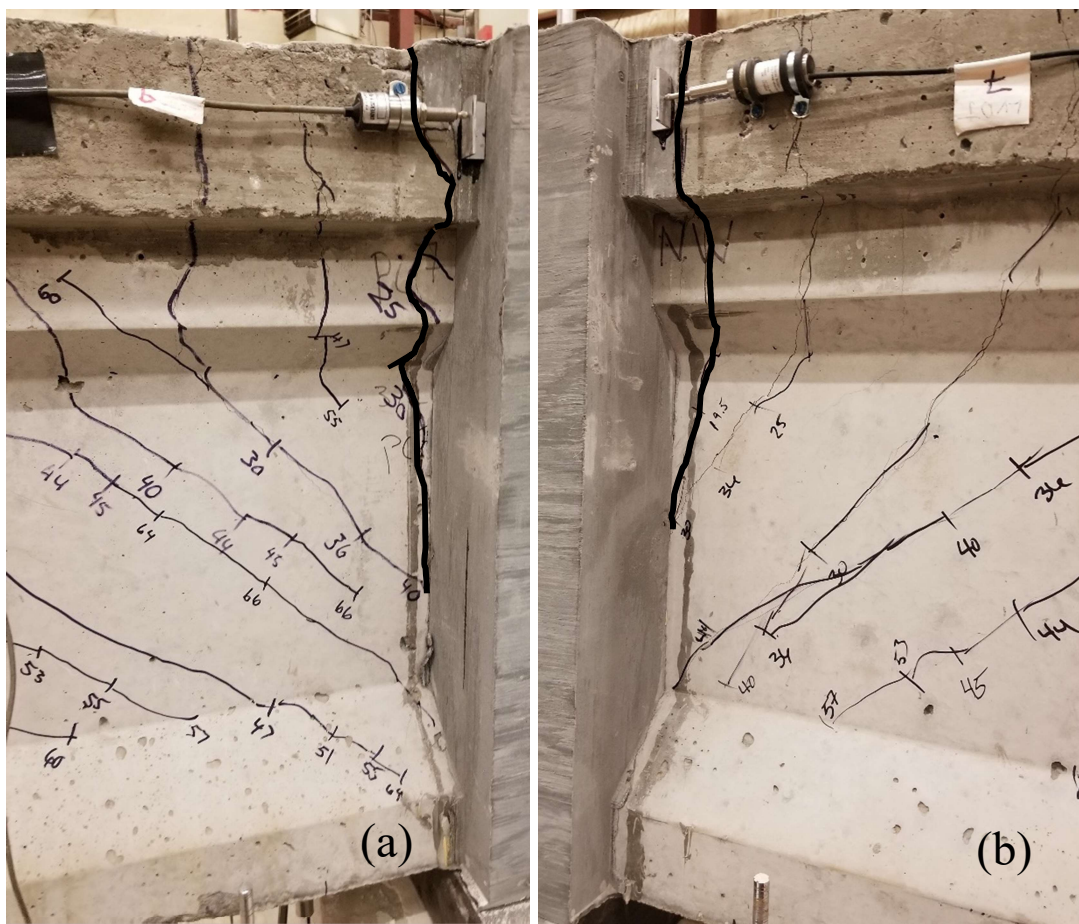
Joint separation at the interface between the RC2-N concrete deck and the UHPC joint with the flexural crack going vertically down in the girder (a) and joint separation at the interface between the RC2-S concrete deck and the UHPC joint with the flexural crack going vertically down in the girder (b) are indicated by dark lines.
